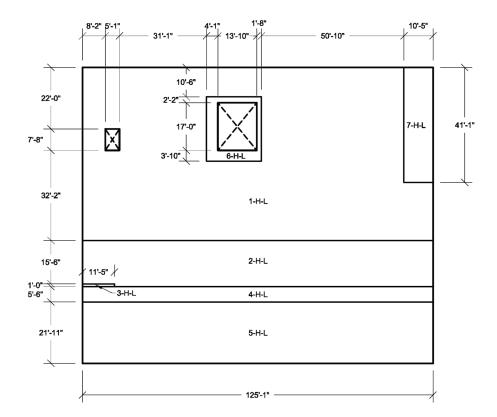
H.3-20 East Wall Looking West Horizontal Reinforcement Zones Far Side Face
